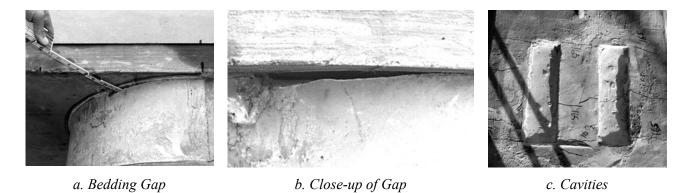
Gaps and Cavities at Double-Line Grout Pocket Connection
